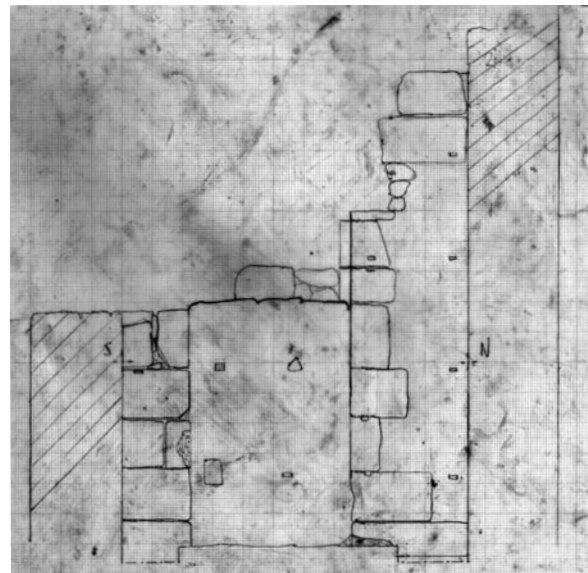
E facing internal elevation of Western Chamber - Drawing No.009
